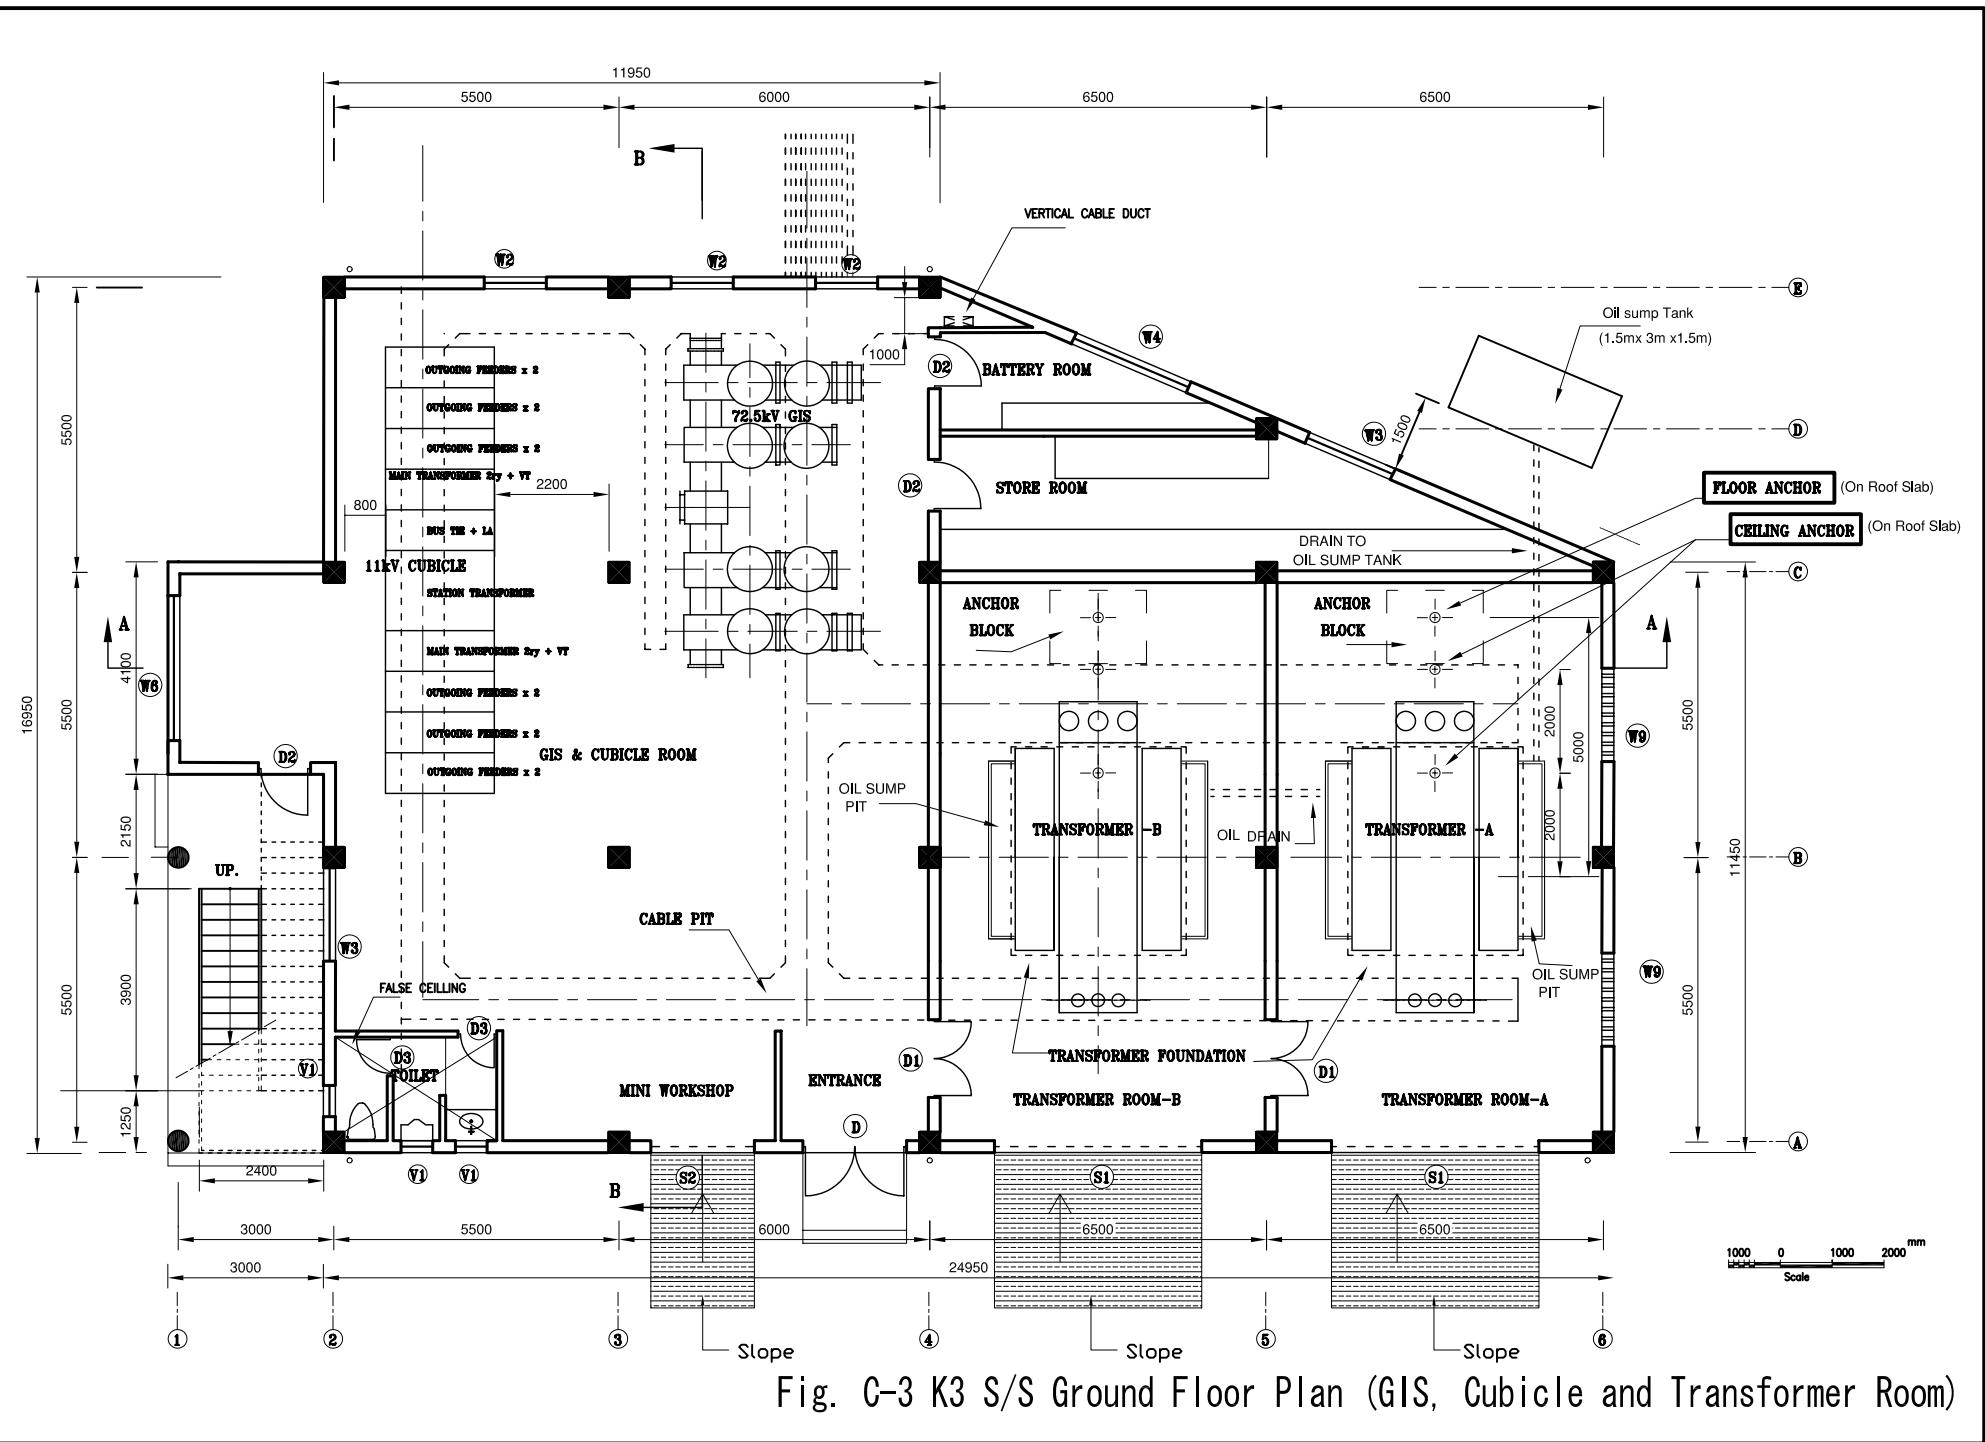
K3 S/S Ground Floor Plan (GIS, Cubicle and Transformer Room)
